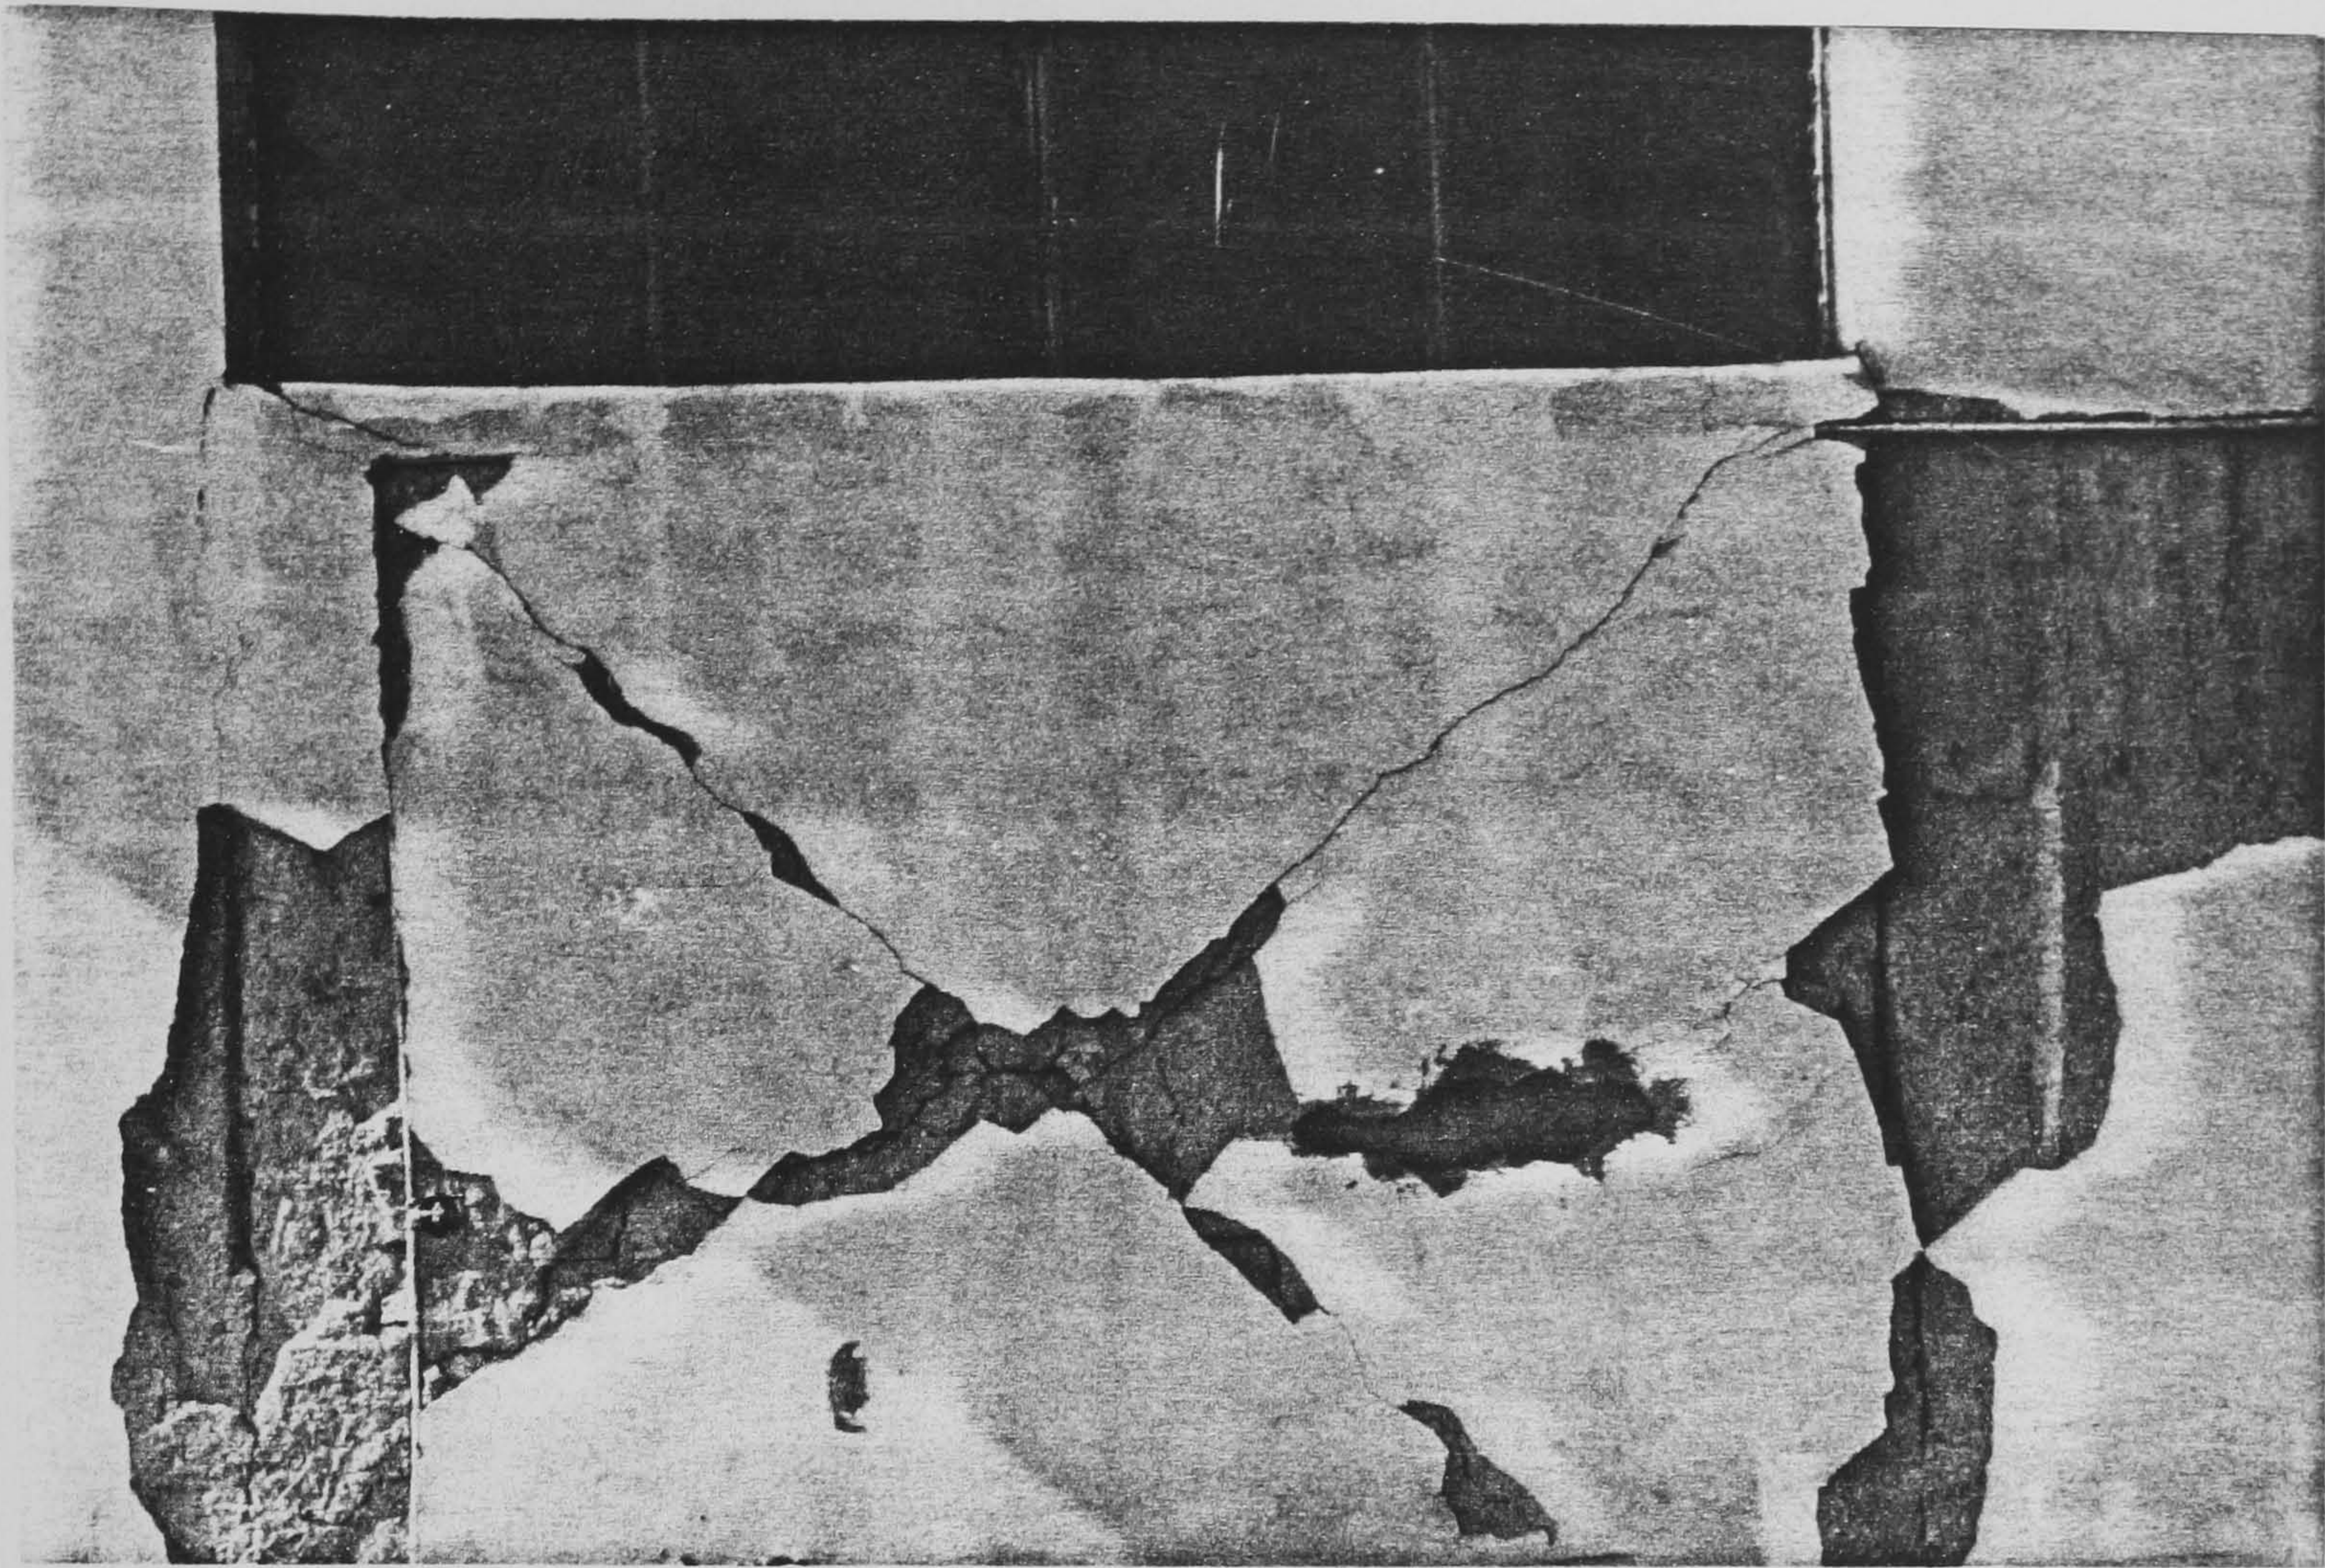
Cross-diagonal tensile failure of unreinforced masonry infill wall
